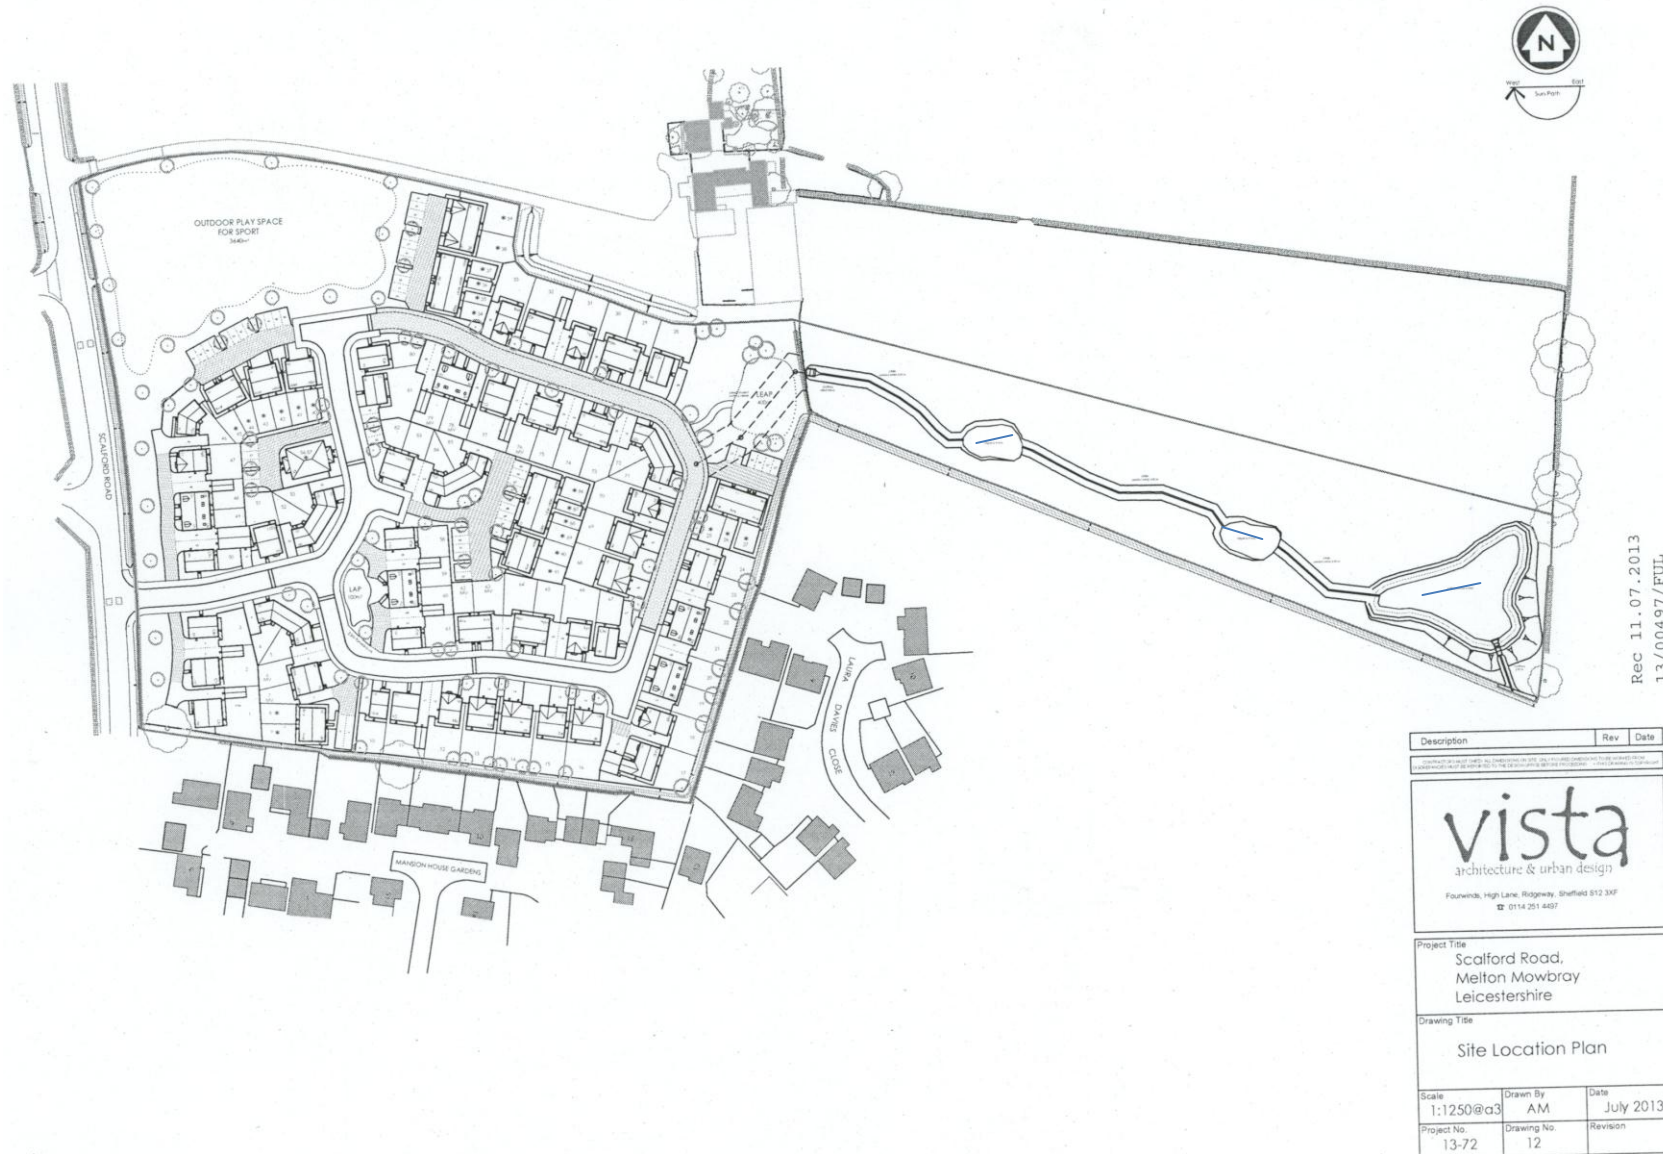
Plan of the proposed development with trenches targeting the balancing ponds
